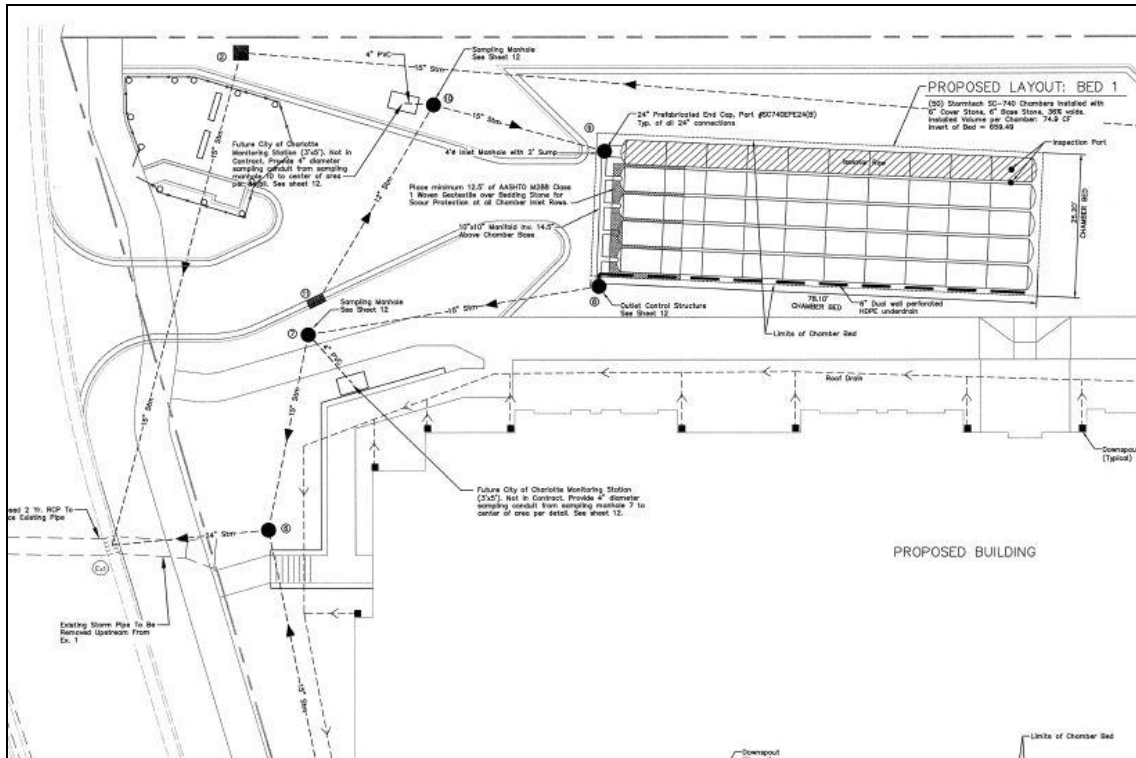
Cherry Gardens Storm Tech Plan View Layout
